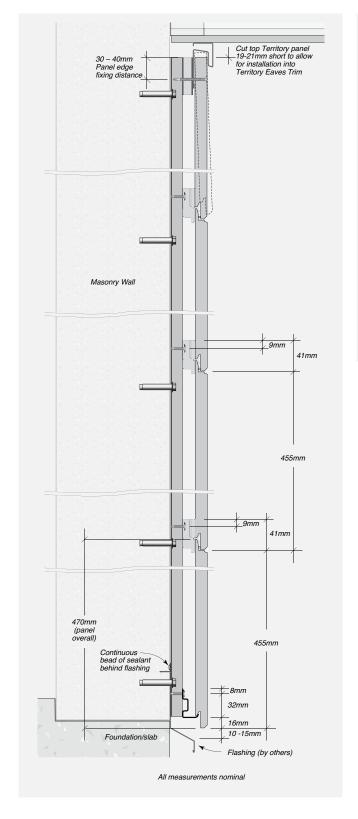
Typical Territory System Cross Sectional Detail for Masonry substrate where face fixing is required – Elevation
